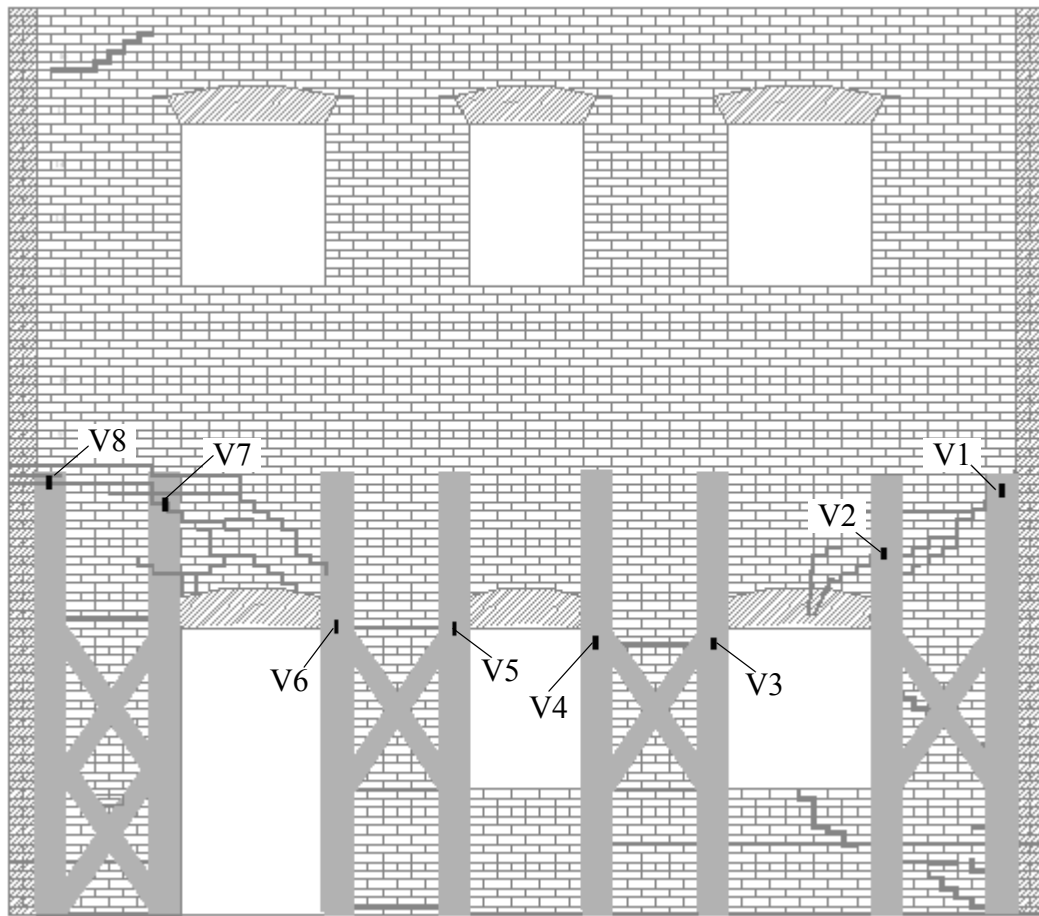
Elevation of Wall B illustrating the location of strain gages attached to the FRP overlays.
